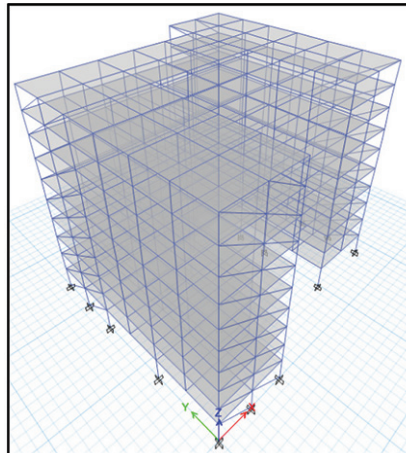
Irregular model with floating column and bracings at Type-1 location – A8
